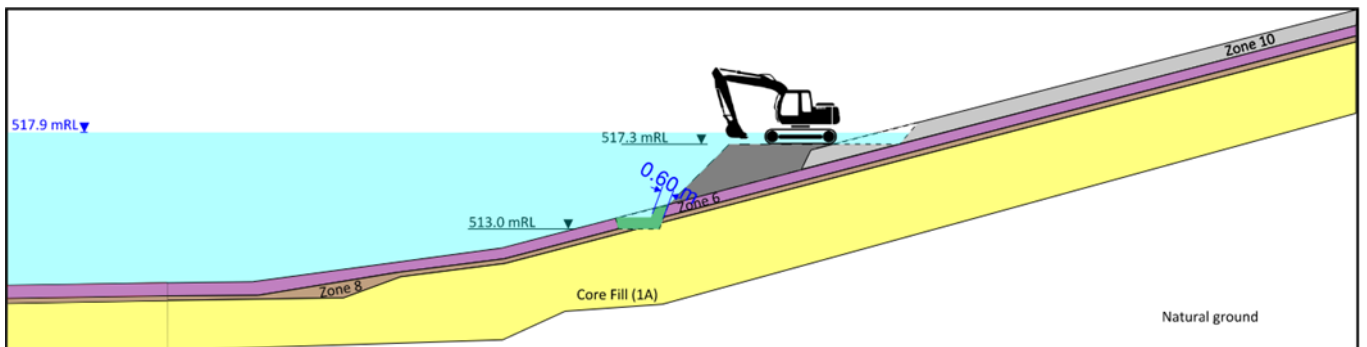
Schematic sketch – Tranche 1 – abutments - construction of key toe at 513.0 m RL and installation of rip-rap bedding
